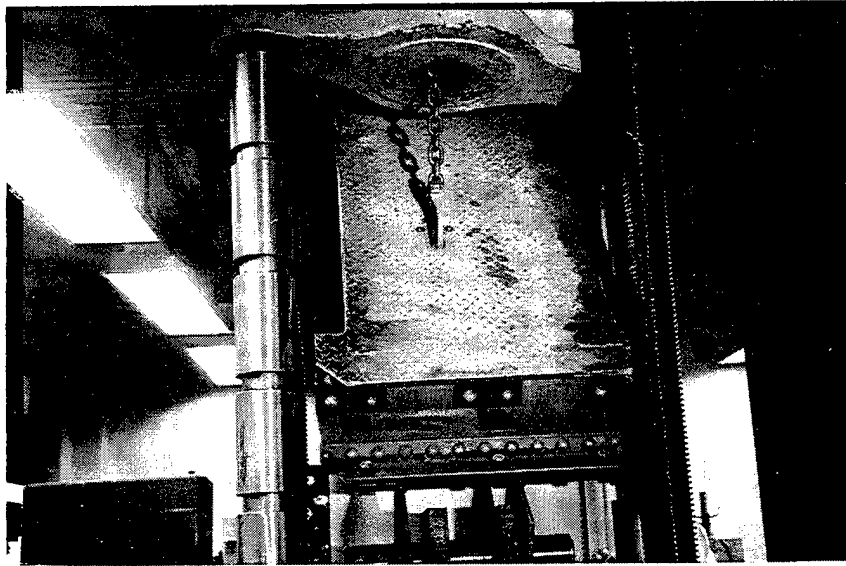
Front view of the large AVLB test section in position in the testing machine for the pull test. The test jig bolted to the bottom of the section is connected by a large round steel bar to another test jig fastened to the lower fixed crosshead. A large chain with the clevis hook around the lifting steel bar in the oblong hole in the floor plate is attached to the upper movable crosshead.
